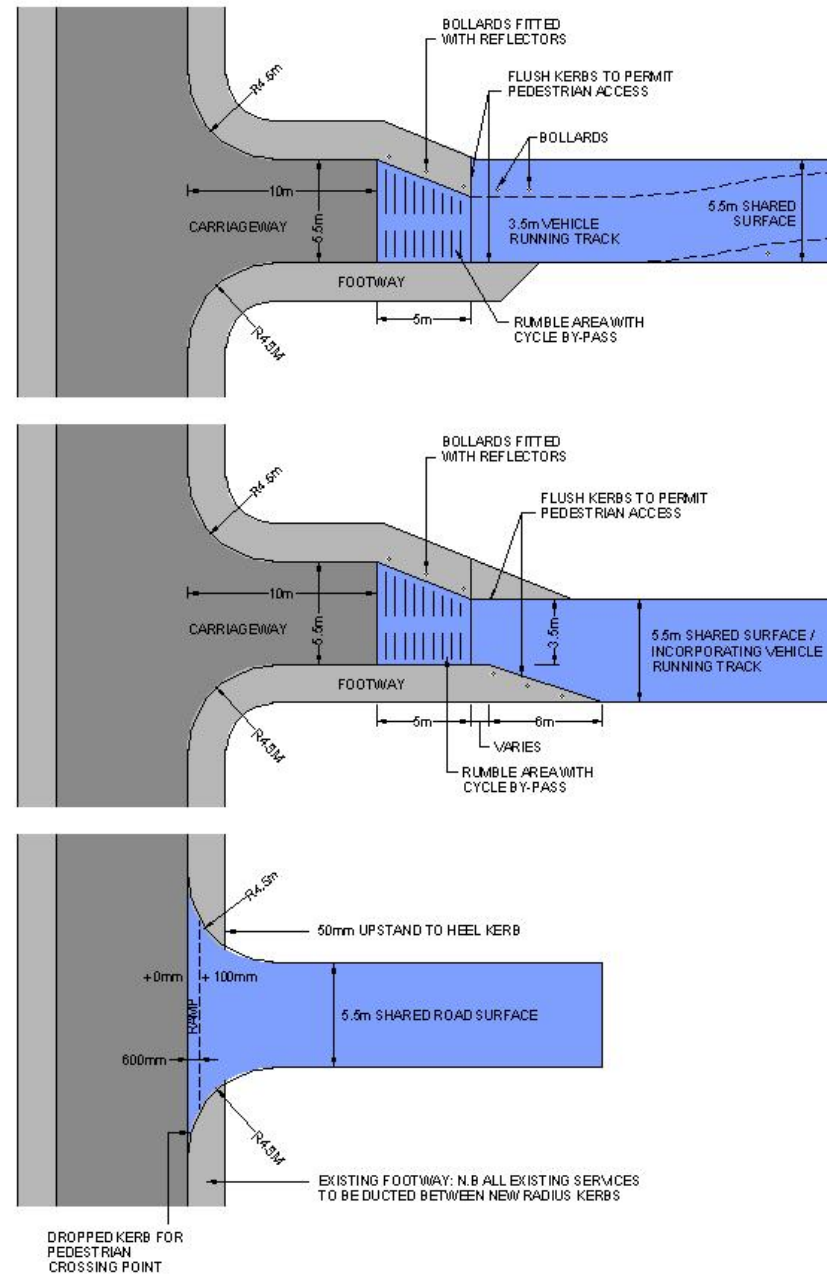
Example Arrangements at Transition to Shared Surface Road
